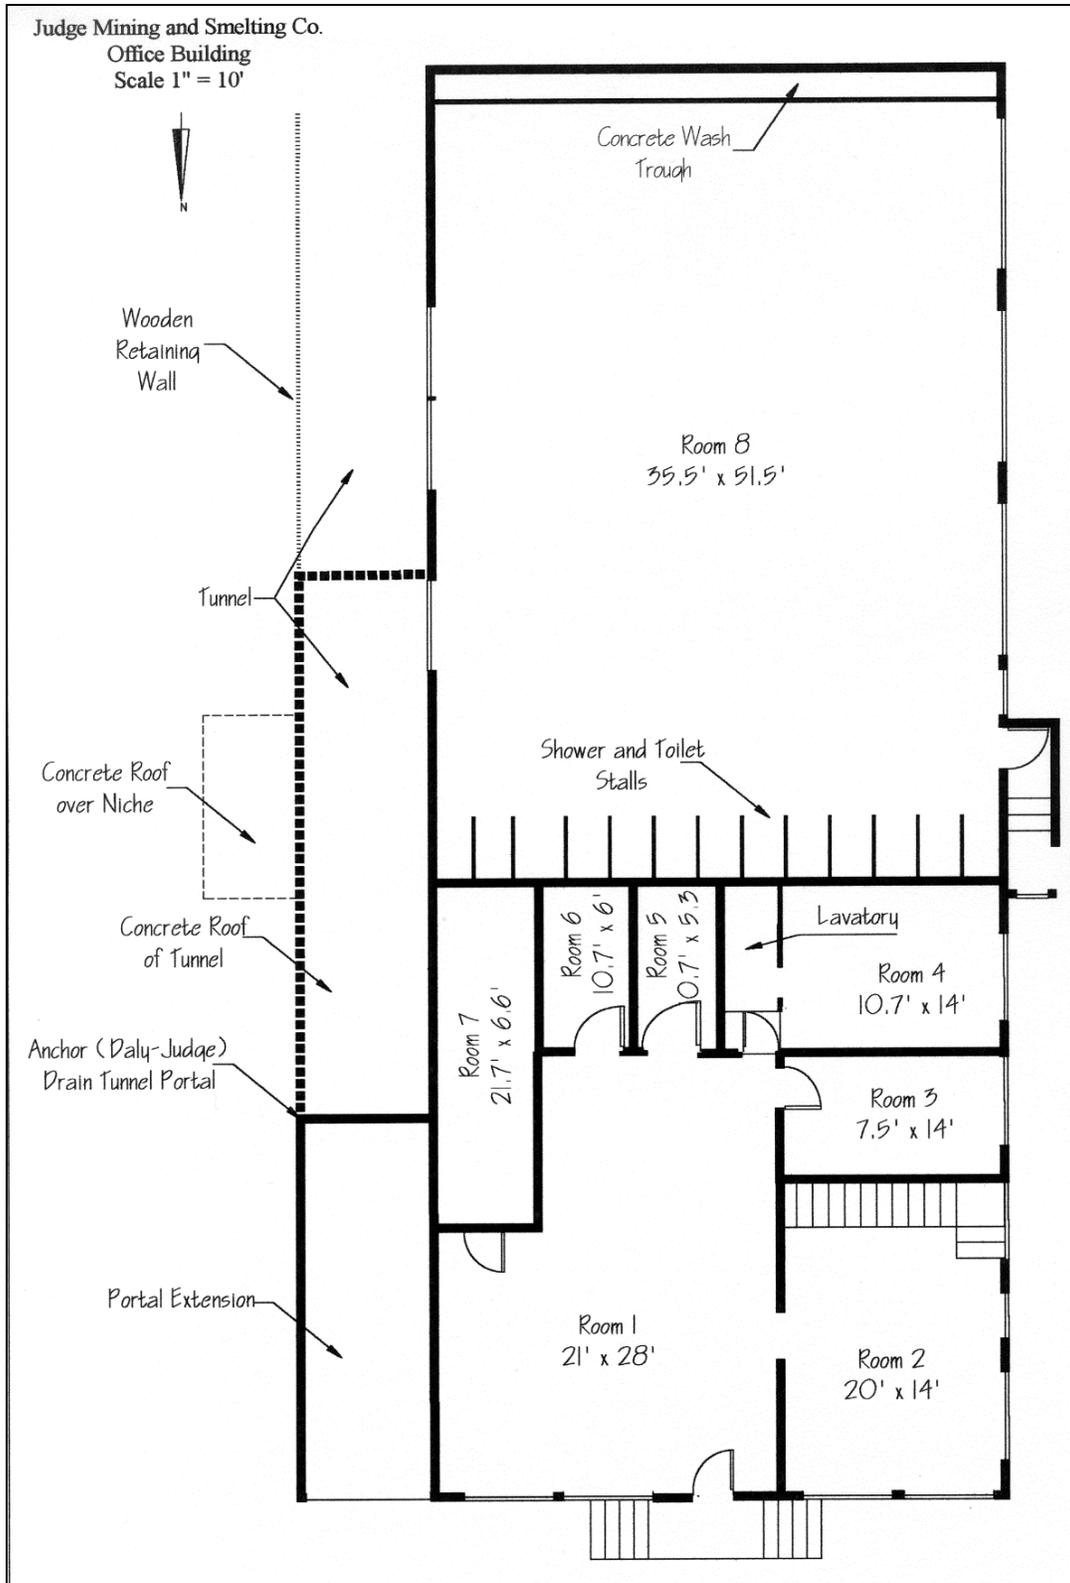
Floor plan (first floor), Judge Mining and Smelting Company Office building (from Bowes et al. 2000).
